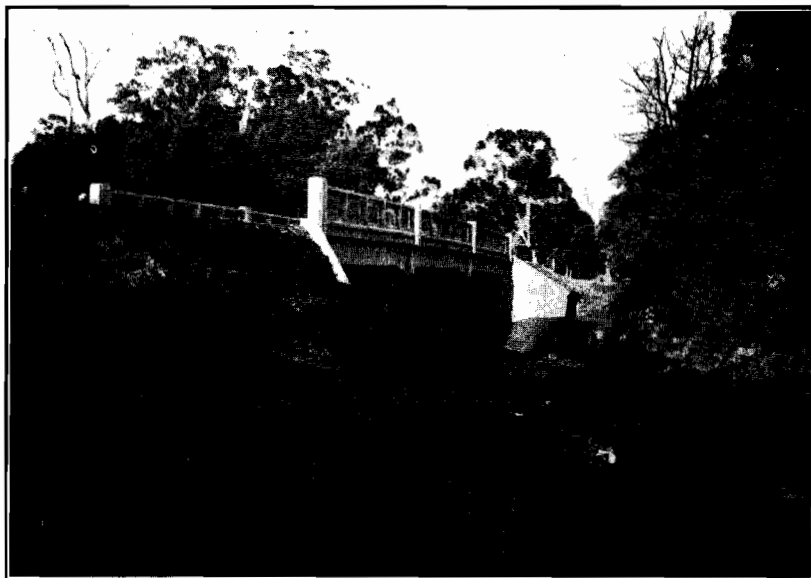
Showing widened bridge over the Yarra River on the Main Healesville Road.
